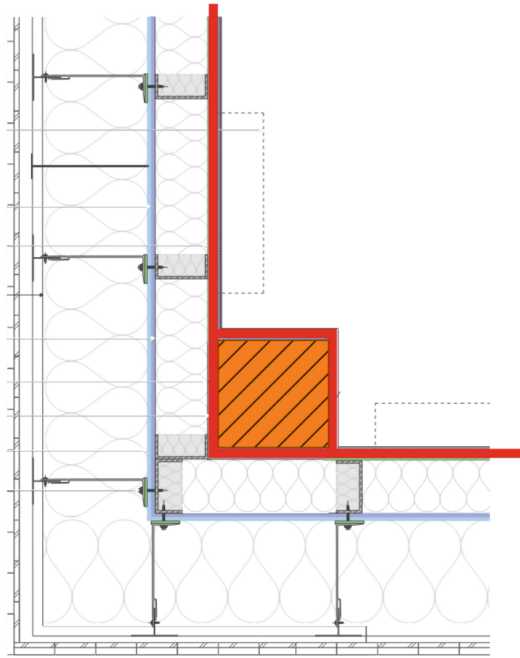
Plan detail view at building corner, showing full encapsulation (red) of a glulam column (orange & hatched)
